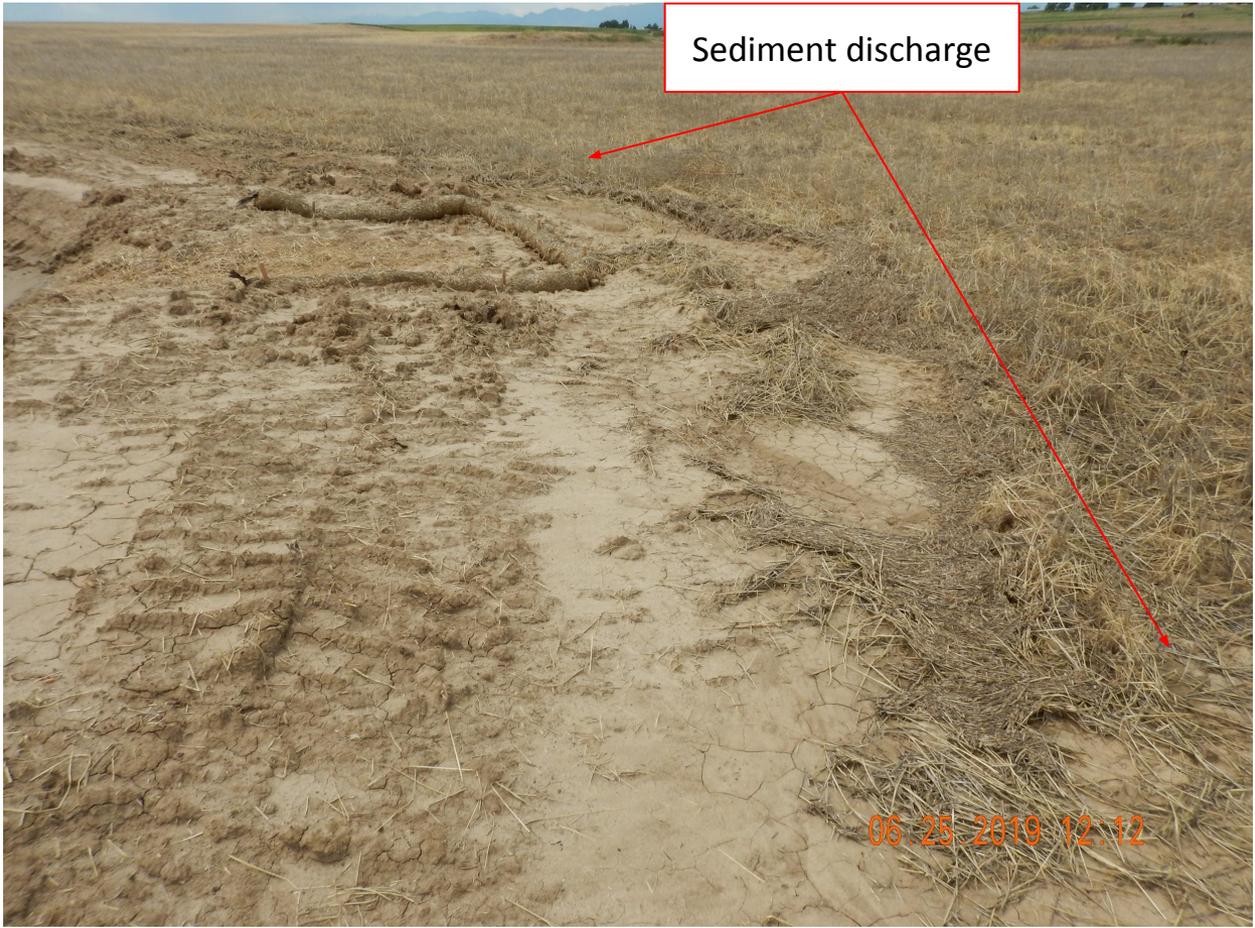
Close up photo taken from northwestern perimeter of location, facing West. Photo illustrates sediment discharge beyond the temporarily stabilized outlet (erosion control blanket).
